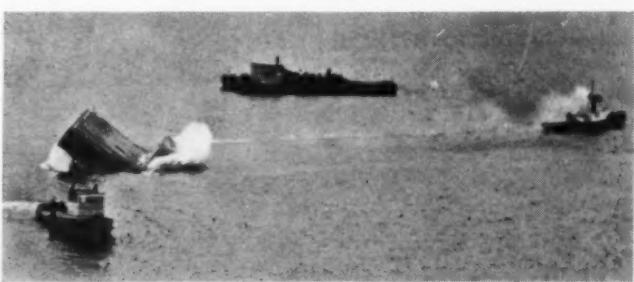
When in Position, the Anchors Are Dumped Off the Scow by an Ingenious Flooding Plan Which Sinks One Side of the Scow. Seacocks Under the Water Line Are Opened and the Tug at the Right Pulls Out Two Safety Plugs on One Side, Permitting Water to Flood One Compartment and Dump the 600-ton Anchor. The Barge in the Background Acts as an Anchor for the Anchor Scow. The Tug in the Foreground, Which Is Equipped With a Two-Way Radio Set for Getting Instructions From the Transitmen on the Shore, Who Also Have a Two-Way Radio Set, Manoevers the Anchor Into a Precalculated Position.
